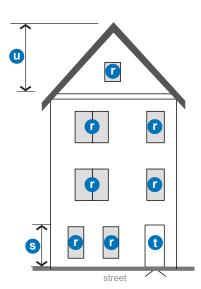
(E)(3) Yard Building: Street Facade Requirements
